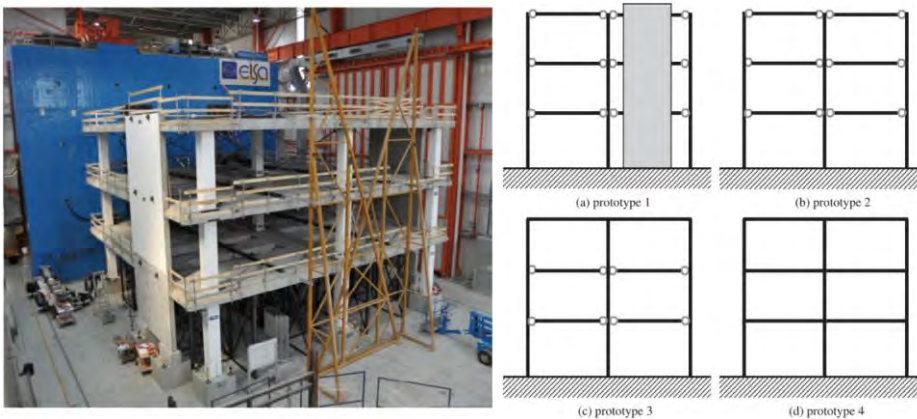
Full-scale 3 storey precast building tested during SAFECAST project [37]
